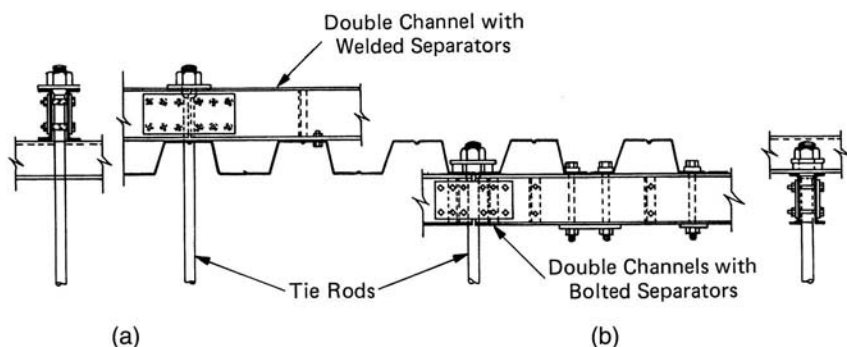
Typical wale details for anchored sheet pile bulkhead: (a) wale located outside of wall; (b) wale located inside of wall
